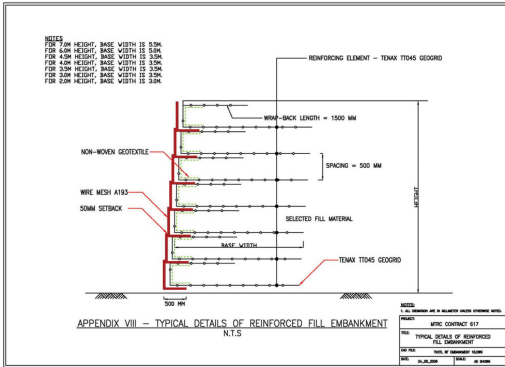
Cross section of reinforced surcharge block (Tseung Kwan O).
